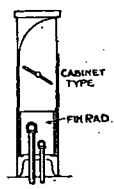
FIN TYPE RADIATOR CONCEALED IN CABINET
